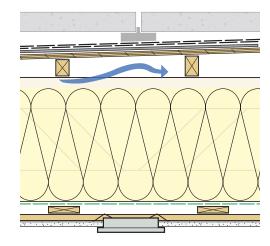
A ceiling service cavity provides space to run services without interrupting the air barrier.
